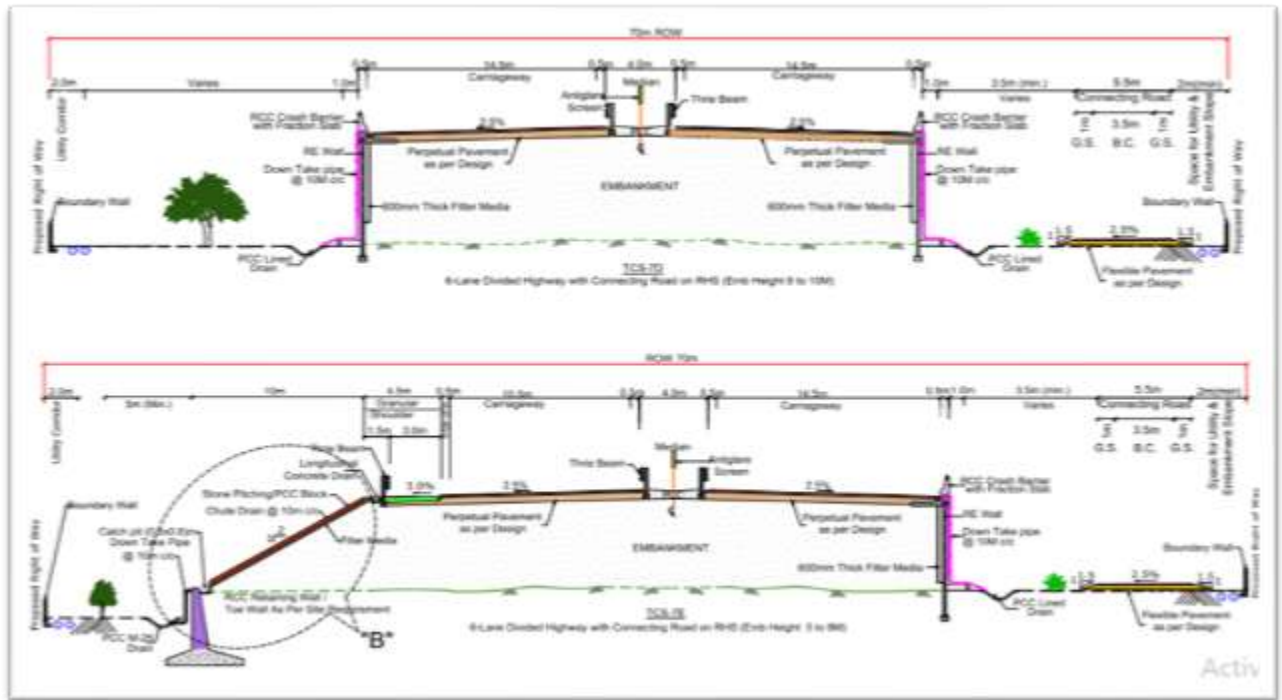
Typical Cross Section Typical Cross Section 7, 7a, 7b , 7c, 7d & 7e
